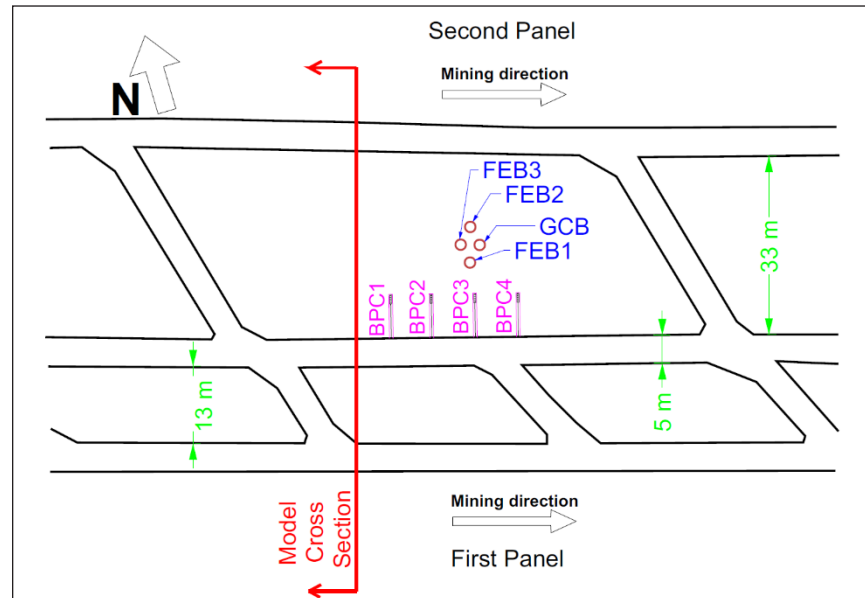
Plan view of the instrumentation layout and three-entry gate road system
